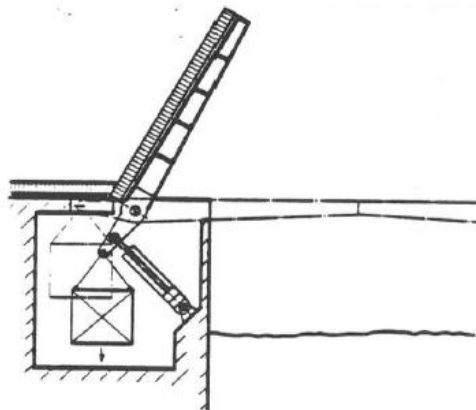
Bascule bridge with fixed pivot and hanging counterweight (KGAL, 2017)
